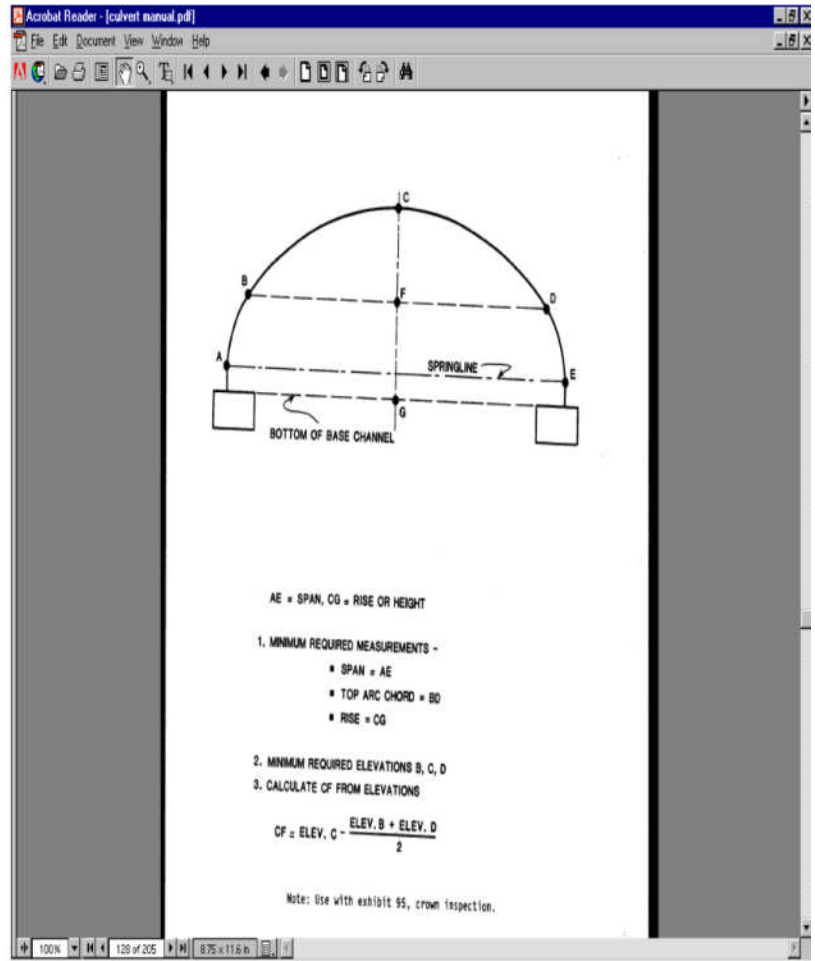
(Exhibit 96) Shape Inspection Low Profile Long Span Arch
